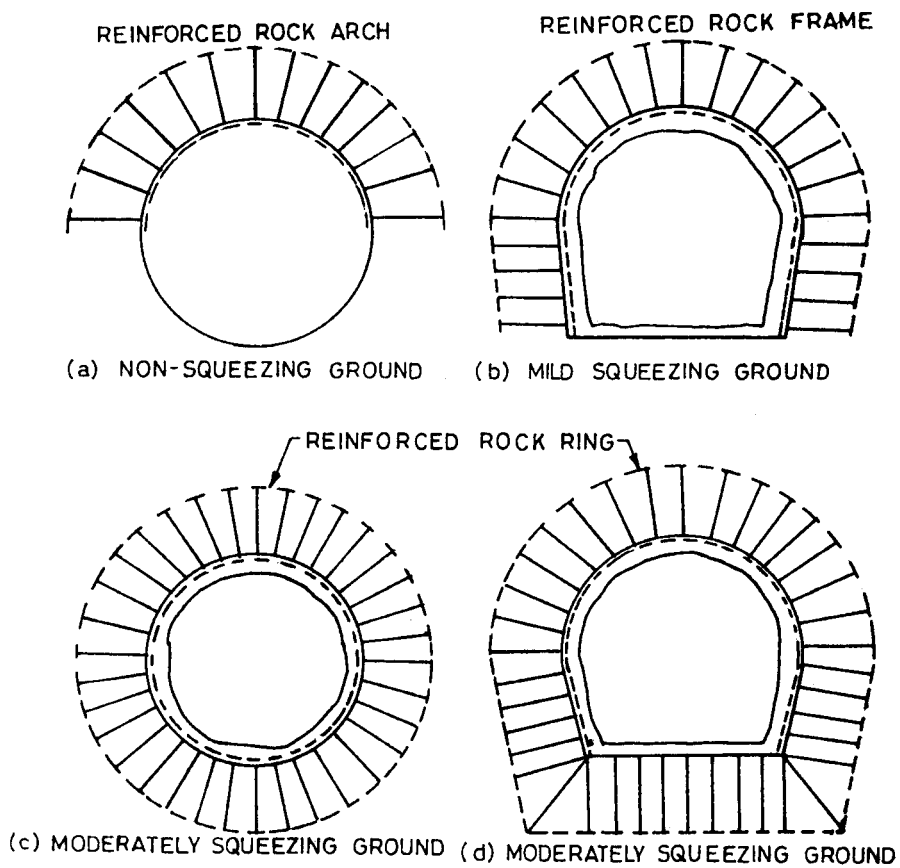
DESIGN PHILOSOPHY OF ROCK REINFORCEMENT IN TUNNELING
